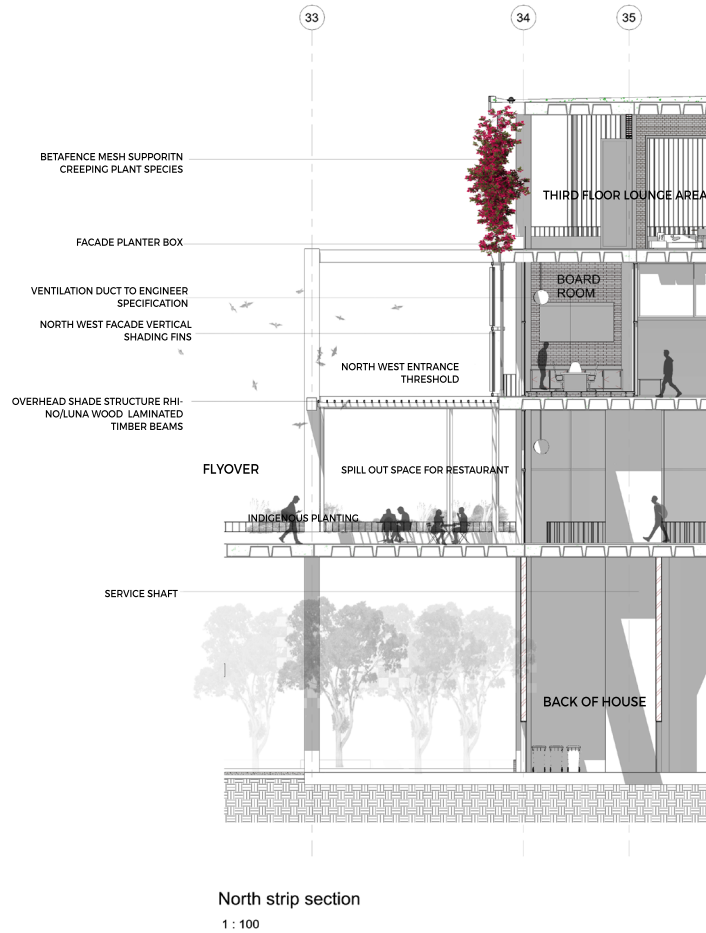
STRIP SECTION 1:100 on A1 (AUTHOR 2021)
